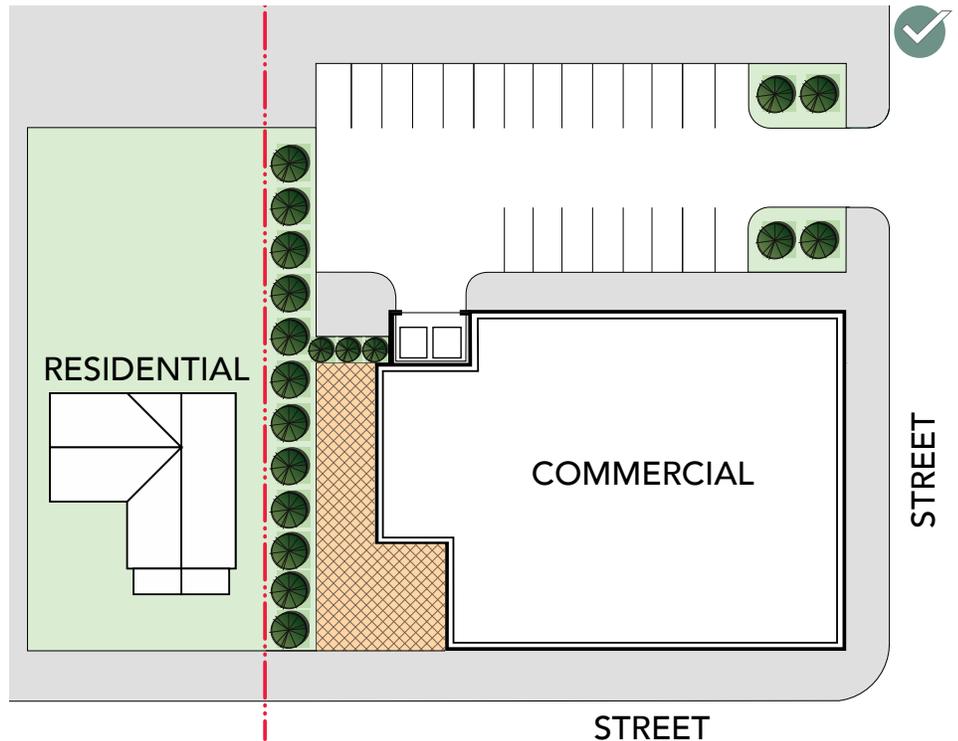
Design a commercial or mixed-use building to be compatible with a neighboring residential site. For example, trash storage should be located away from the street and towards the interior of the site, and landscaping and open space can help present a softer edge to the residential site.
